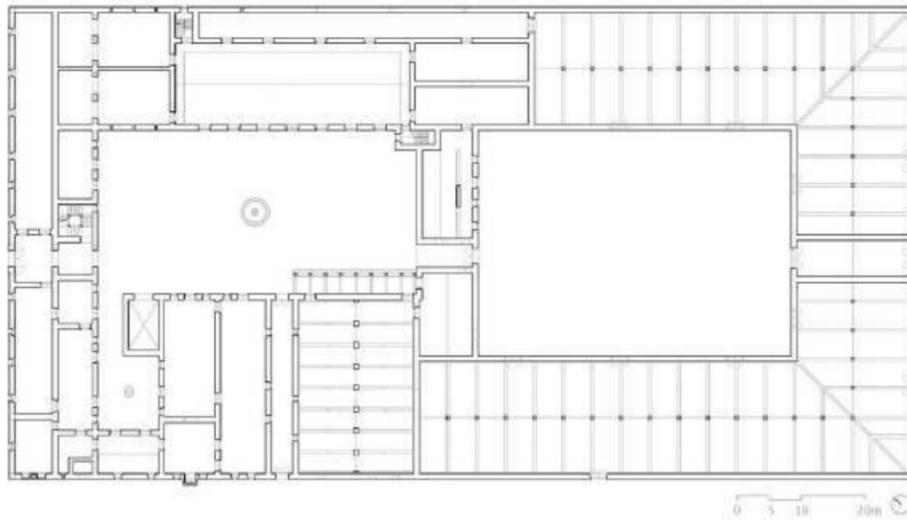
Graphic reconstruction of the Iturbietta shearing plant. Author's drawing.
